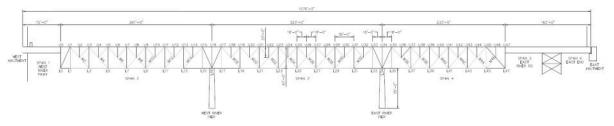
Overall Bridge Elevation looking North (See Appendix C1 for larger view)
